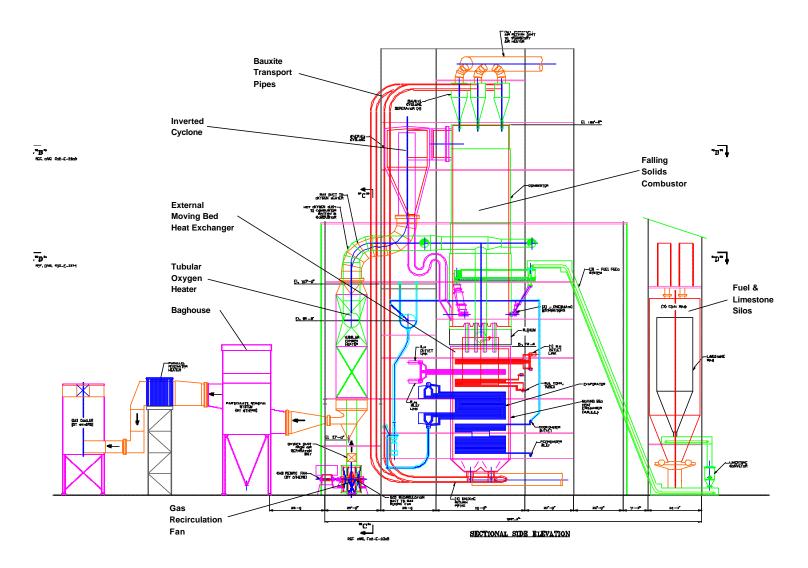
2: Case-4 Boiler Island General Arrangement Drawing – Side Elevation
